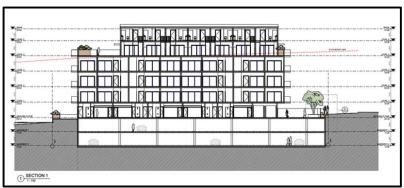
Figure A: Section 1 of the proposed building showing the 12.5m height limit as red dotted line
